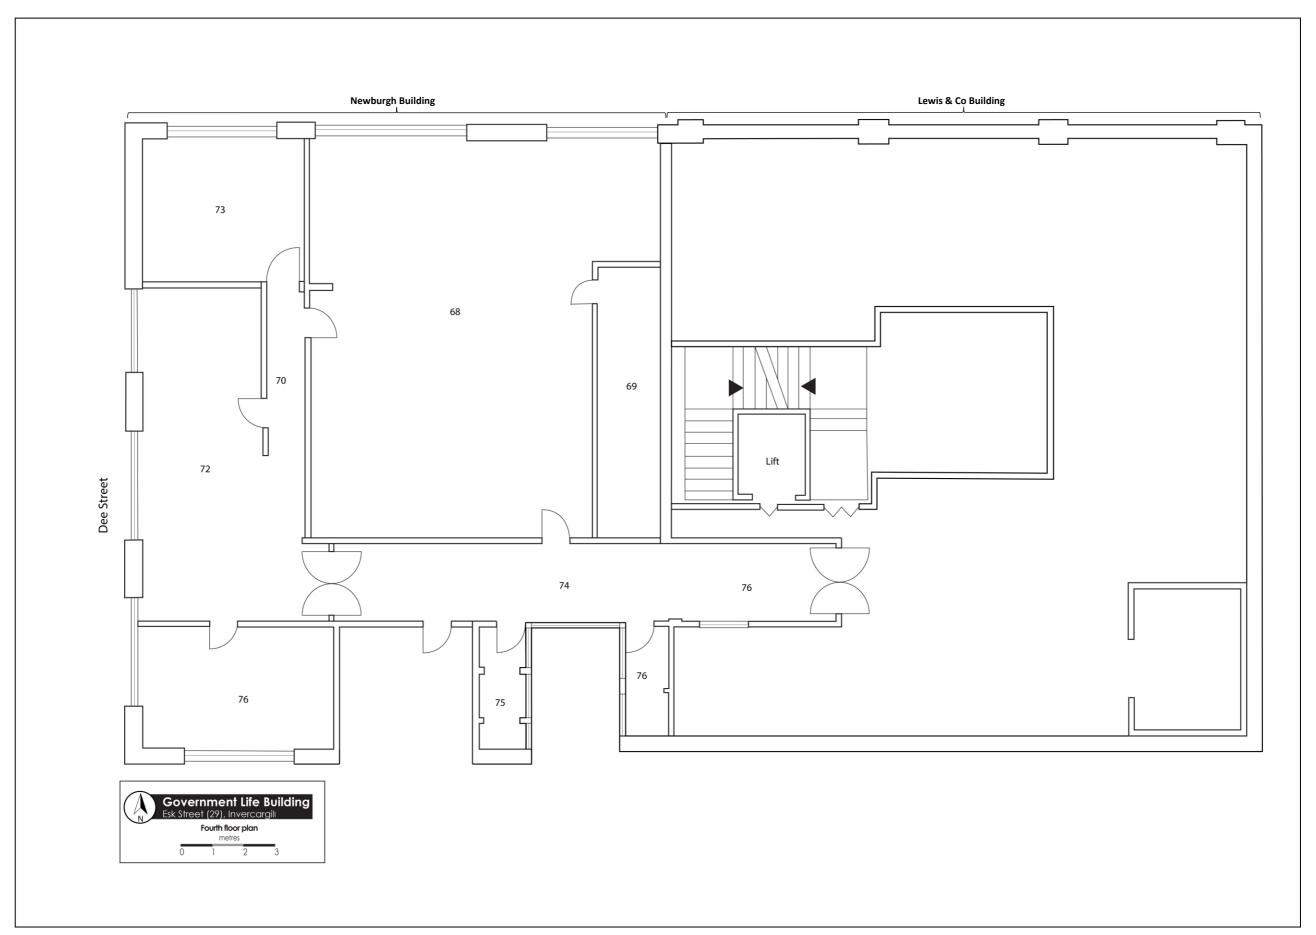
Fourth floor plan of the Lewis & Co. (right) and Newburgh (left) Buildings, collectively known as the Government Life Building.
